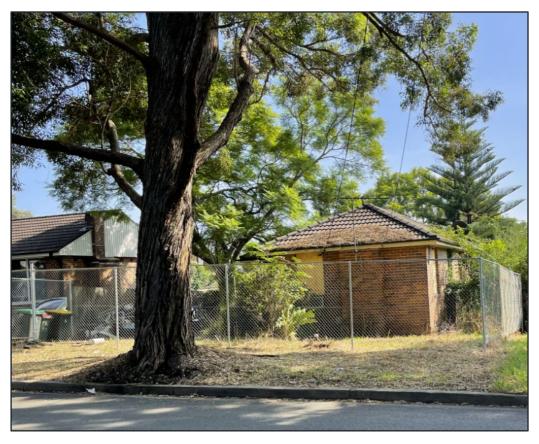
Development site – 12 Munmurra Road (Source: LAHC Site Visit on 16 April 2024)
